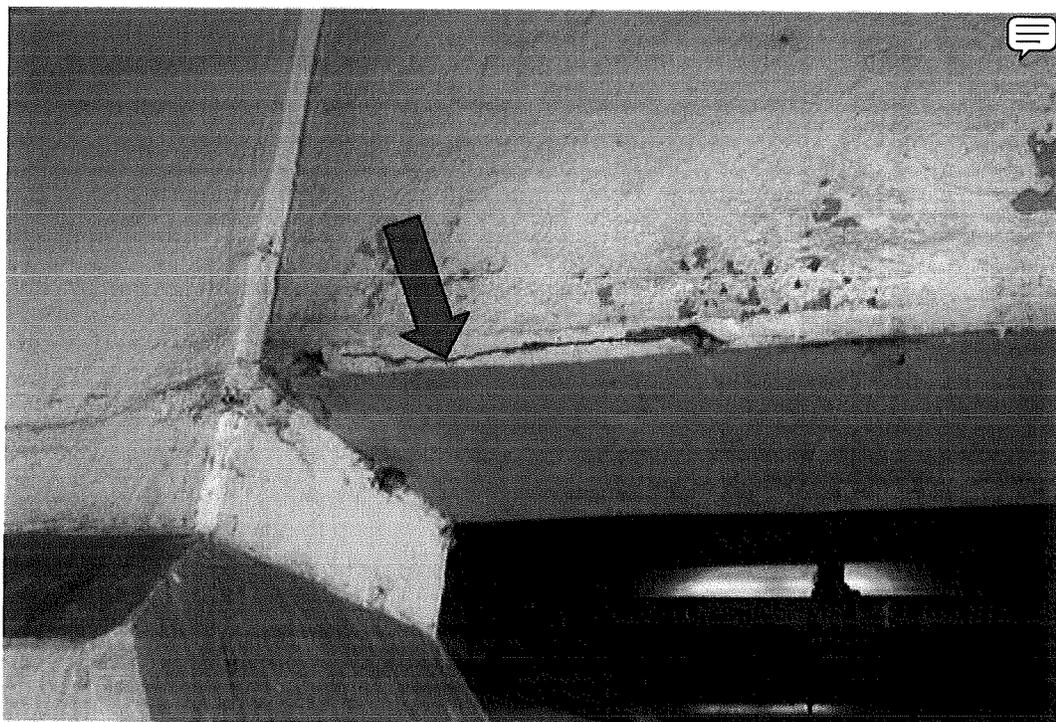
Cracked and hollow sounding concrete at the underside of truss member. At Column Line 7/U1, underside of Car Parking Level 7. (Approx. 4 SF)
